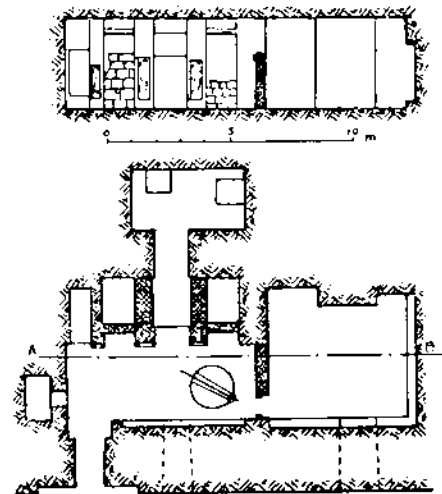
Plan and section of the rock-cut tomb of Debehen (Giza, cruciform type).
